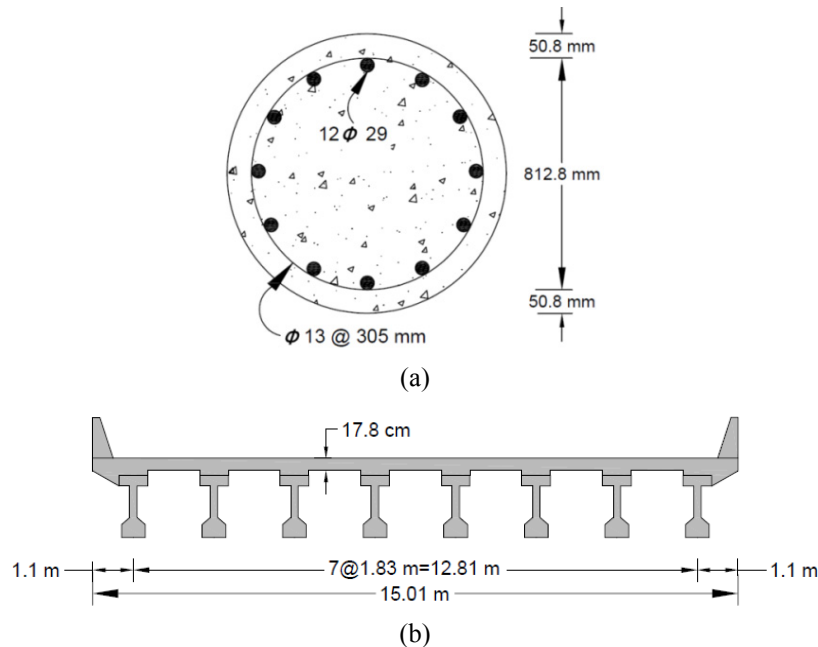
Concrete member reinforcing layout: (a) column; (b) deck detail
